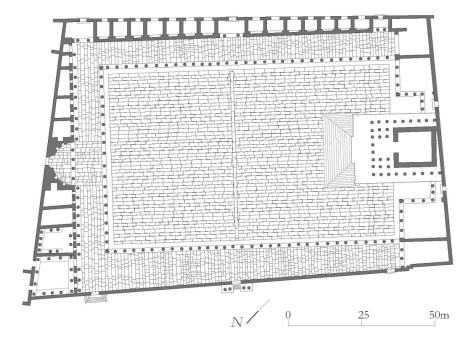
New severan forum plan - Reconstruction of the order of the portico
